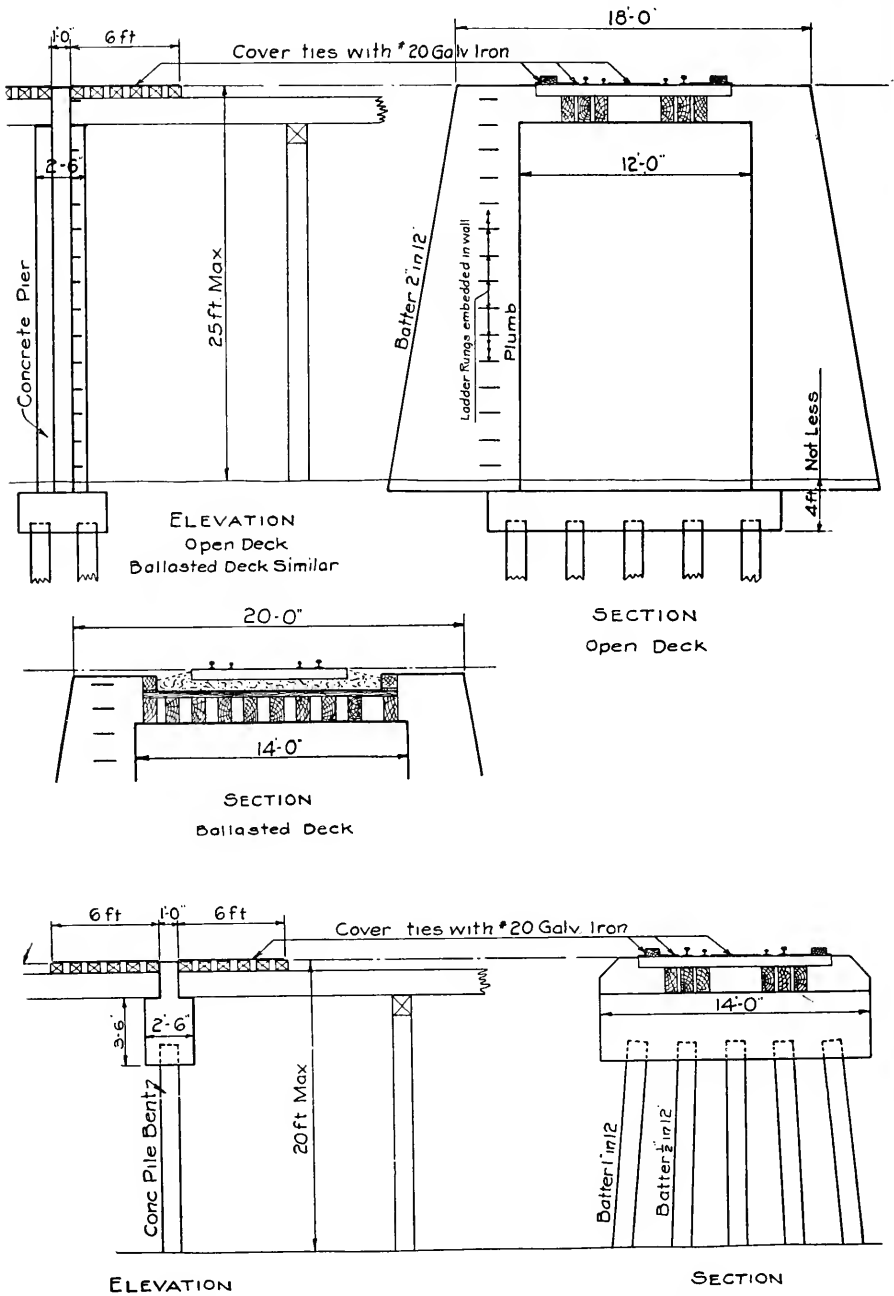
Reinforced Concrete Piers and Bents as Fire Stops.
